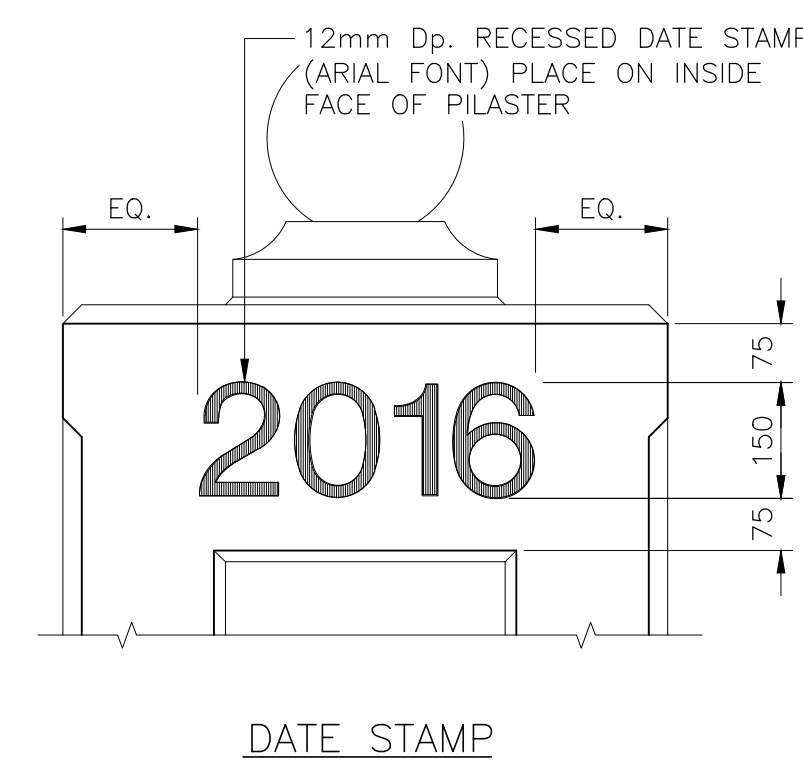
DETAIL – TYPICAL BARRIER PILASTER 1 S5
